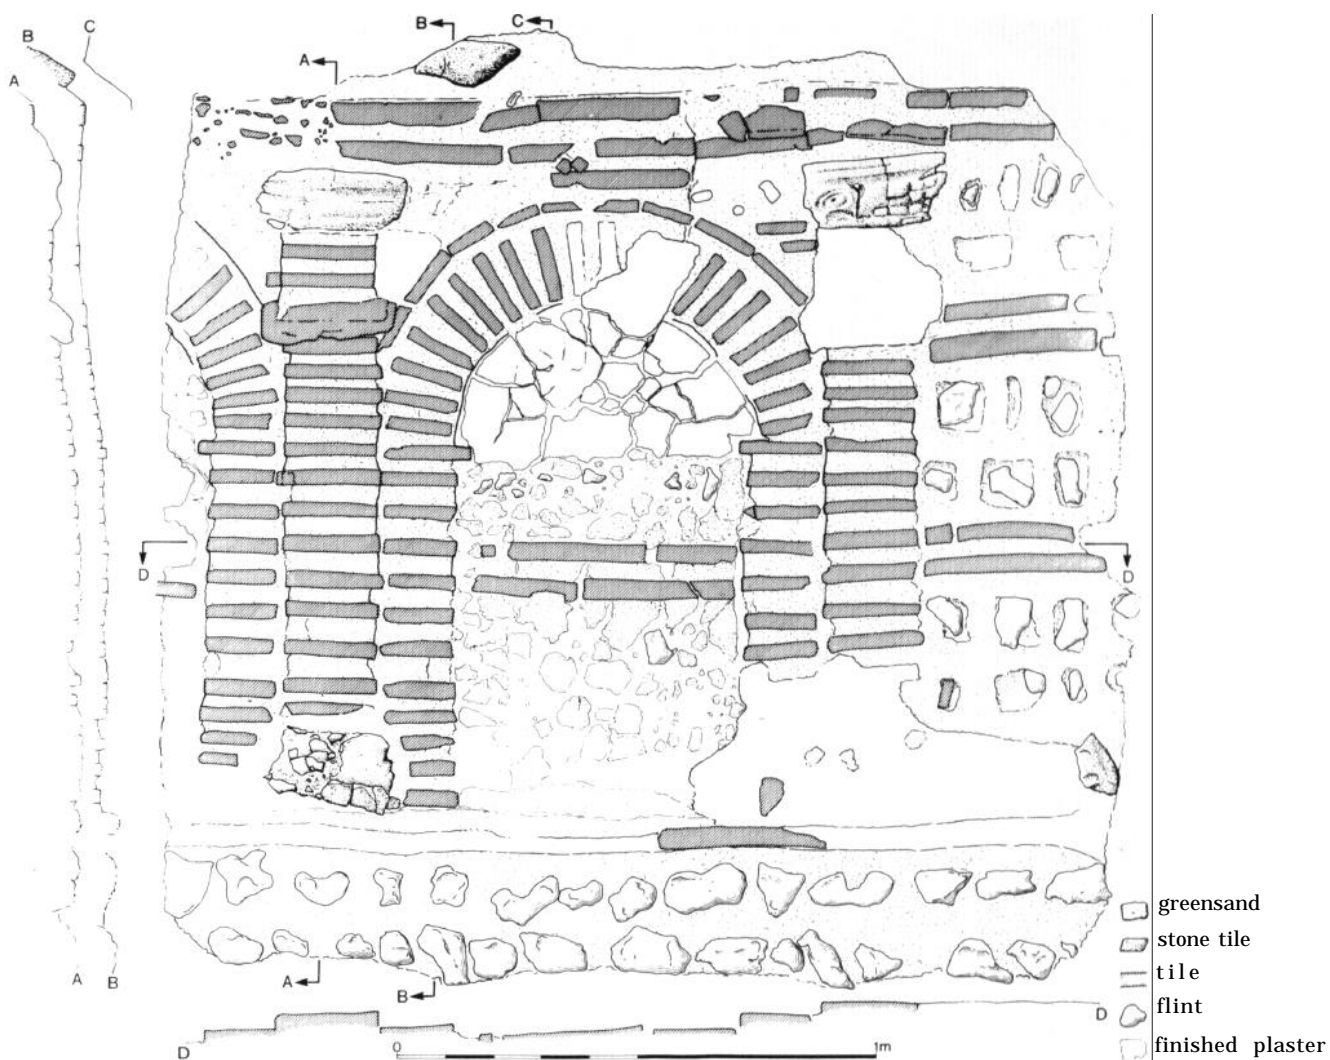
Meonstoke: front face of the lifted upper window, plan and sections
